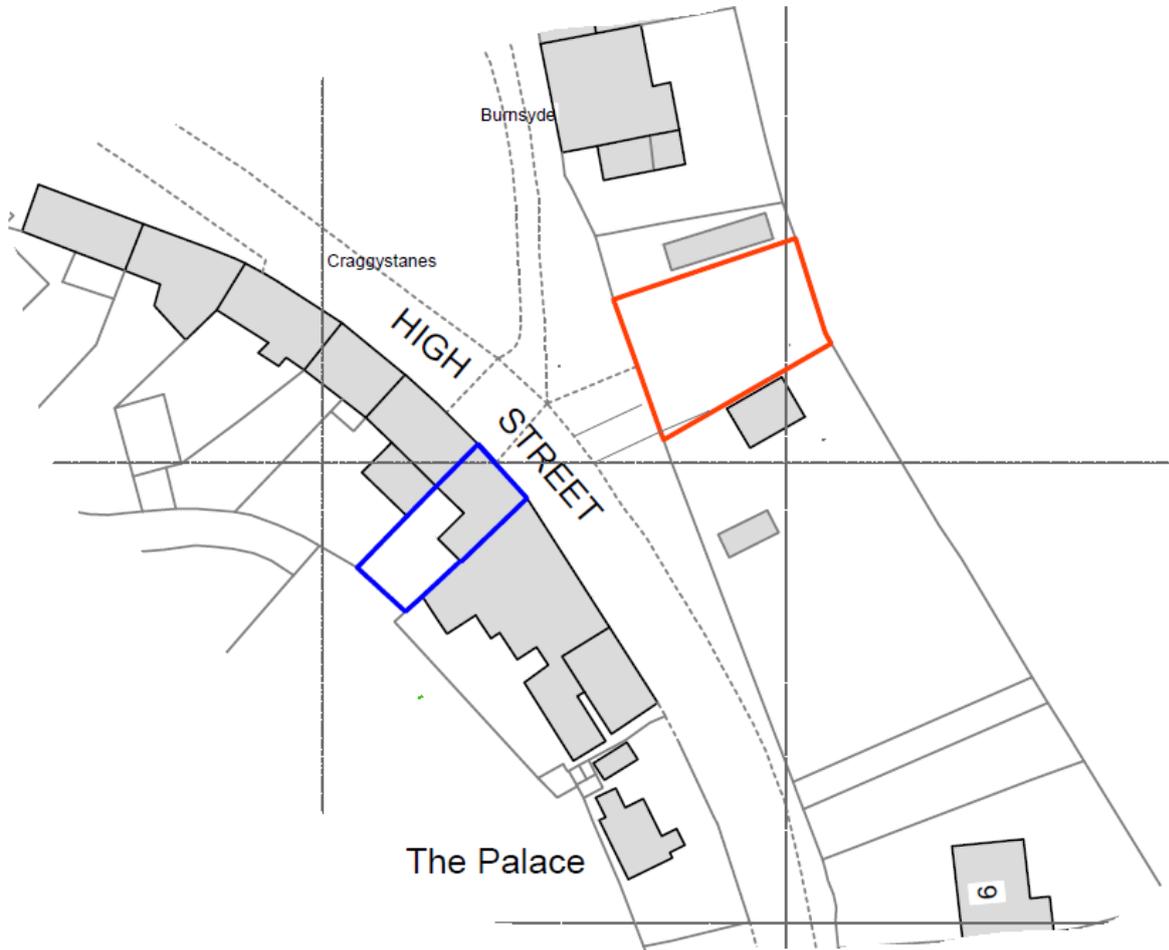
Extract from AH073-P03(A) Location Plan, High Street and the Applicants' home are visible to the west of the site (Source: Aidan Hume Design)
